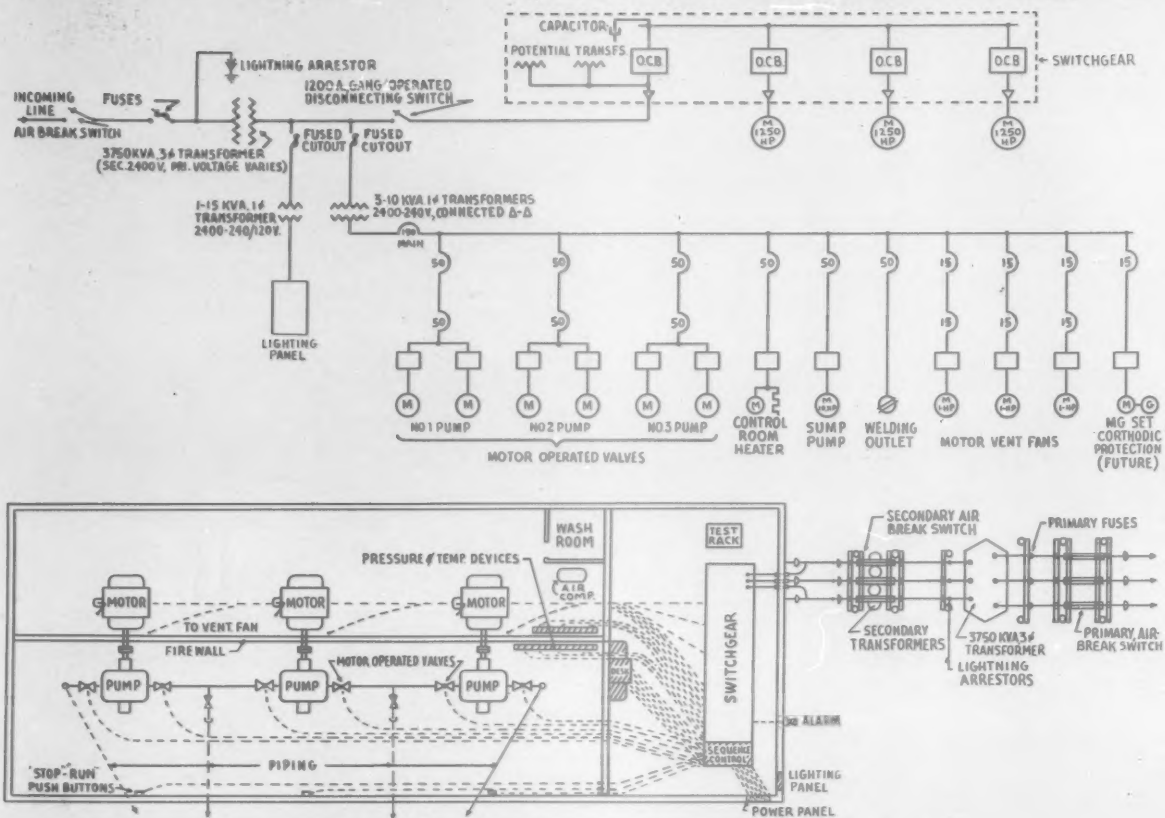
One line schematic of wiring and plan of power layout for typical 3-unit pumping station.
